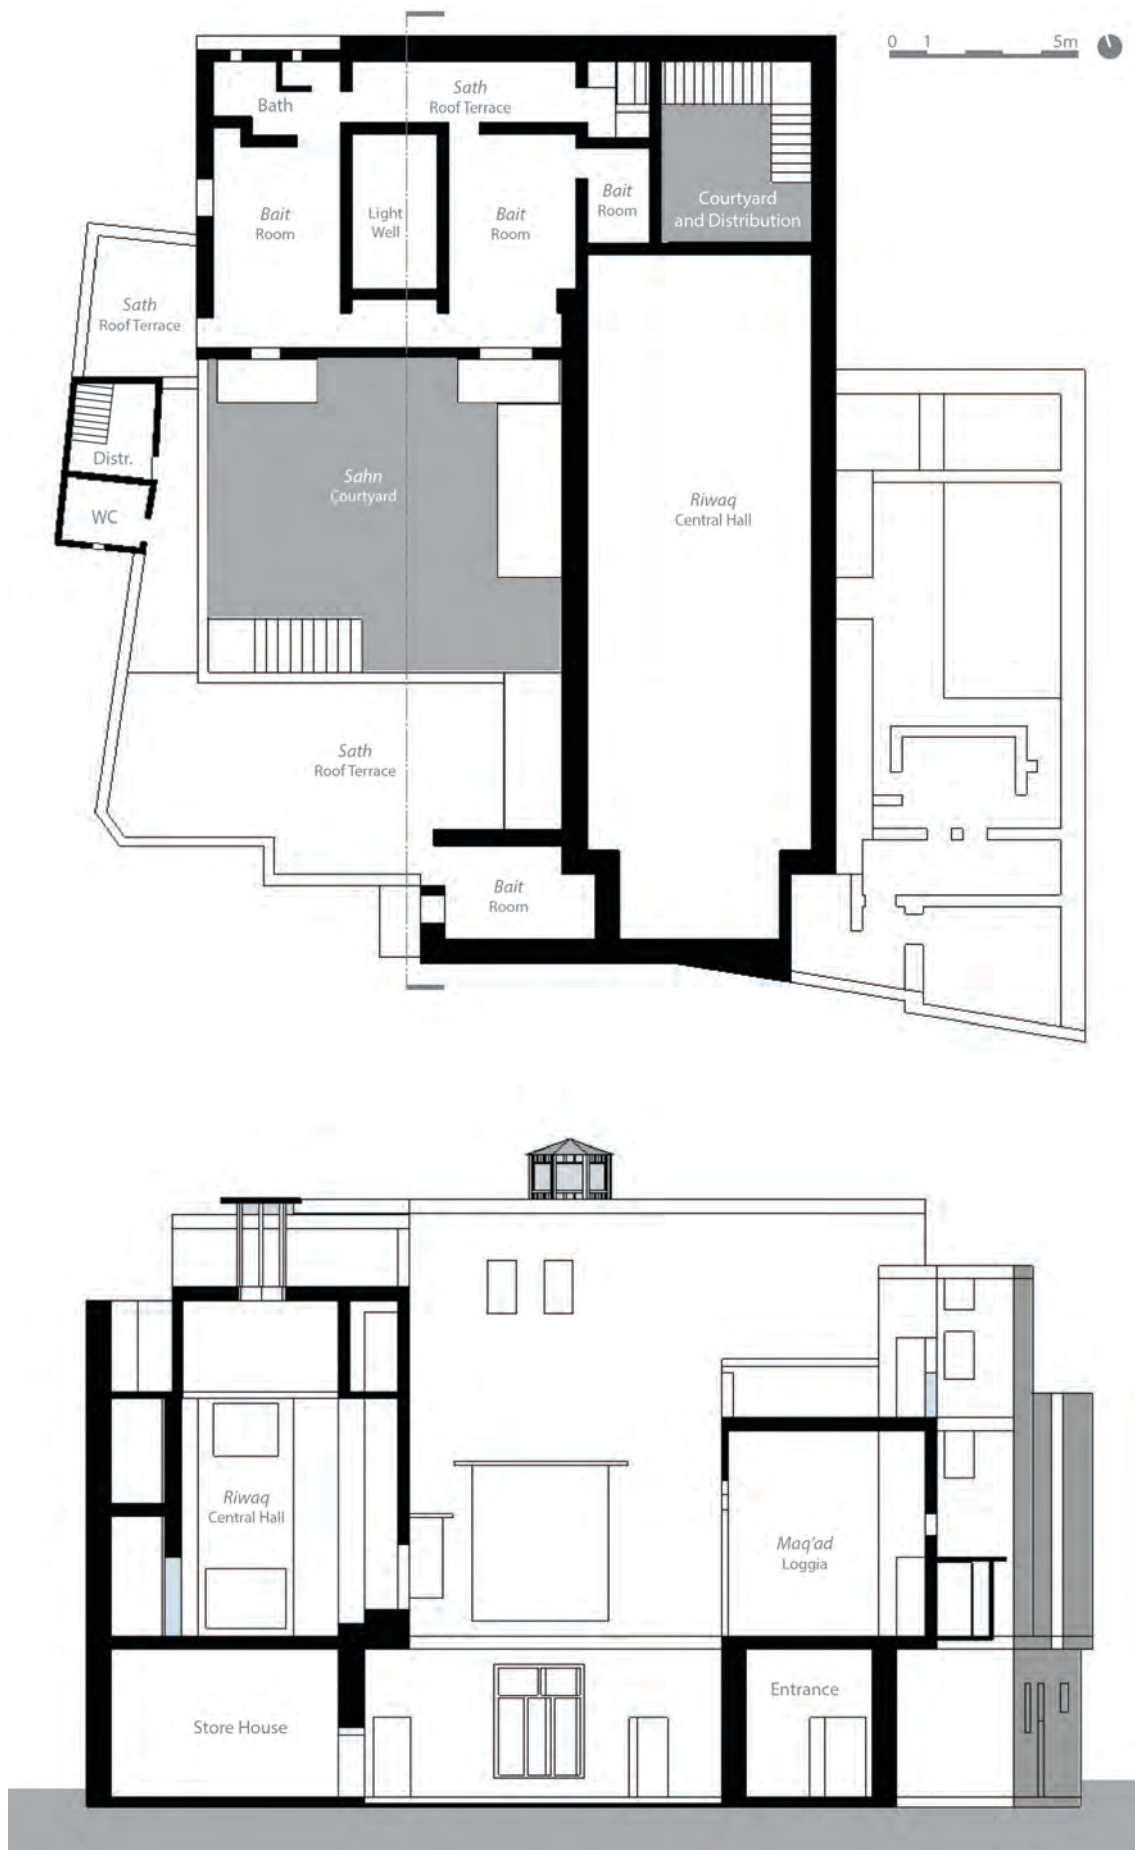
Manzil Zaynab Khatun – Third floor and section North-South.
